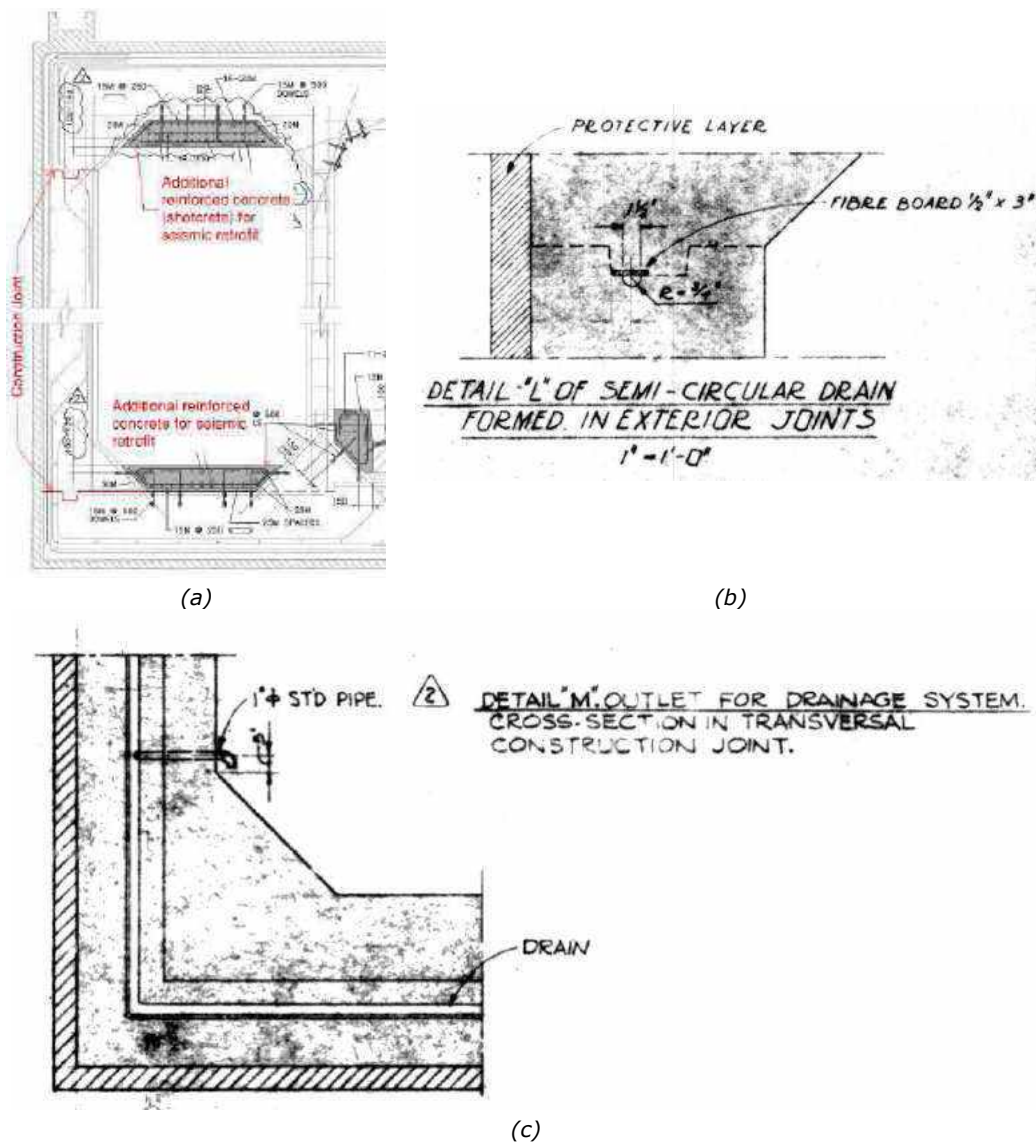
Construction joint details in precast concrete tunnel elements including (a) location of construction joints in outer walls (shown in red) from drawing 1509-39 (location of reinforced concrete added in air ducts as part of seismic retrofit is shown in grey), (b) drain detail used in the transverse construction joints between segment and contraction pours from drawing 3-J-3099, and (c) outlet pipe for drainage system in transverse construction joints.
